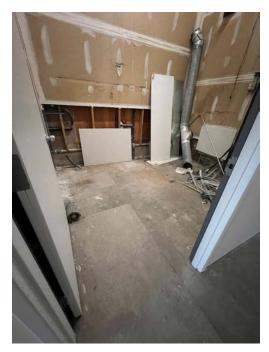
Floor Slab in Former Harbour Pointe Cleaners (Suite B6) (November 14, 2024)
